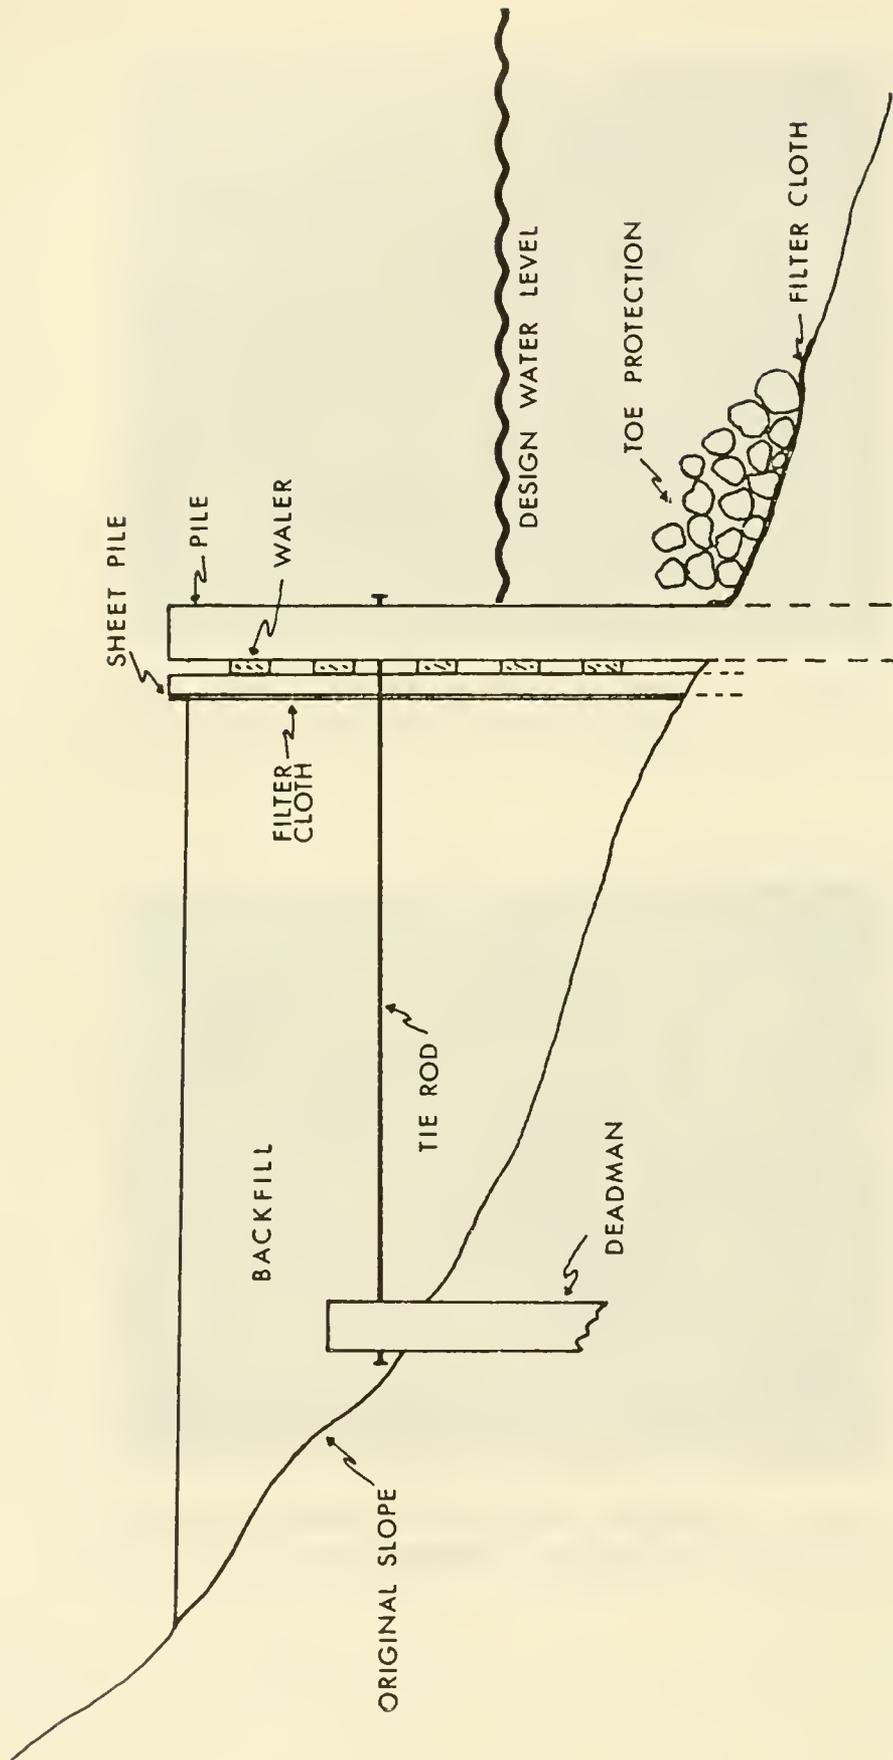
Side view of a typical sheet pile bulkhead. Dimensions and details to be determined by particular site conditions.
